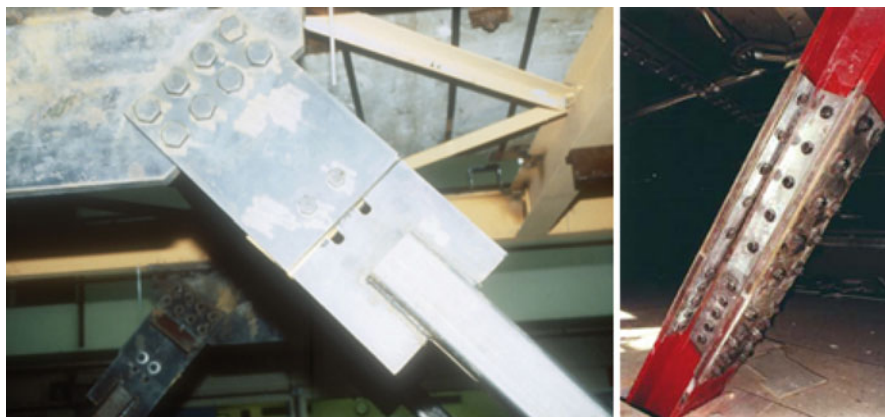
Details of the slotted bolted connections dampers (Fitzgerald et al. 1989)
